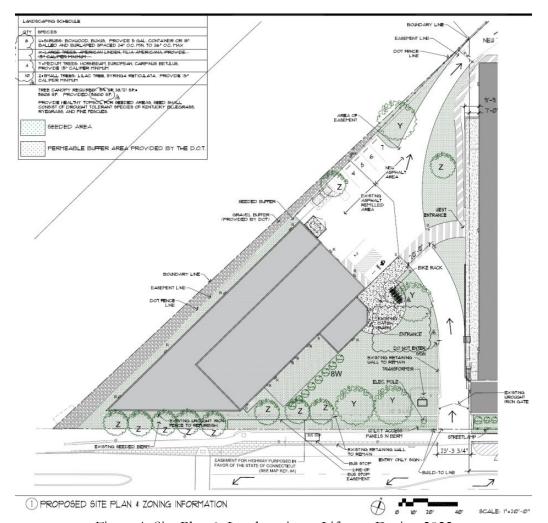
Site Plan & Landscaping – Lifecare Design 2022
